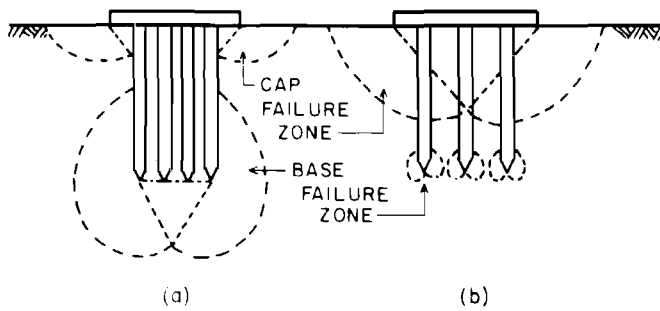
Failure zones at piled foundation: (a) pier failure, (b) individual pile failure.
